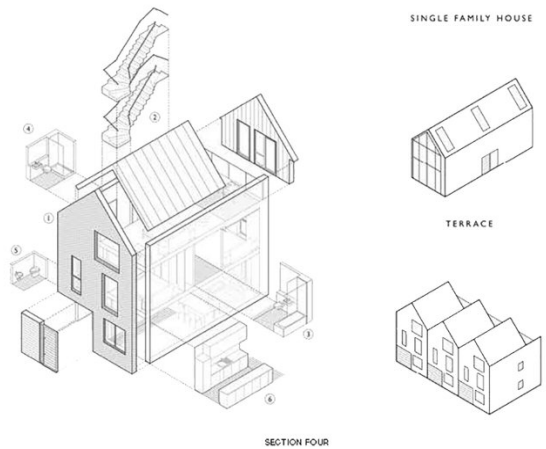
Town House in new Islington, Manchester (Shedkm Architects, 2016).
